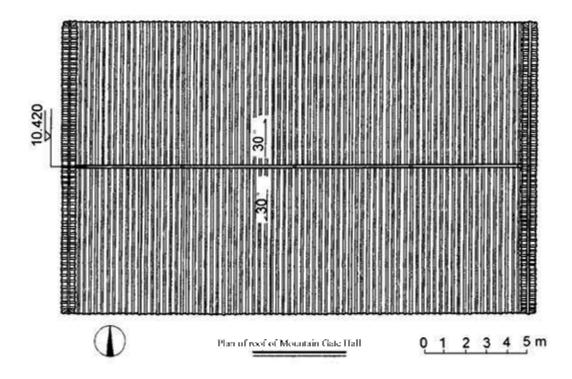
B. The plans of the Hall (Tang Guohua, 2001).
